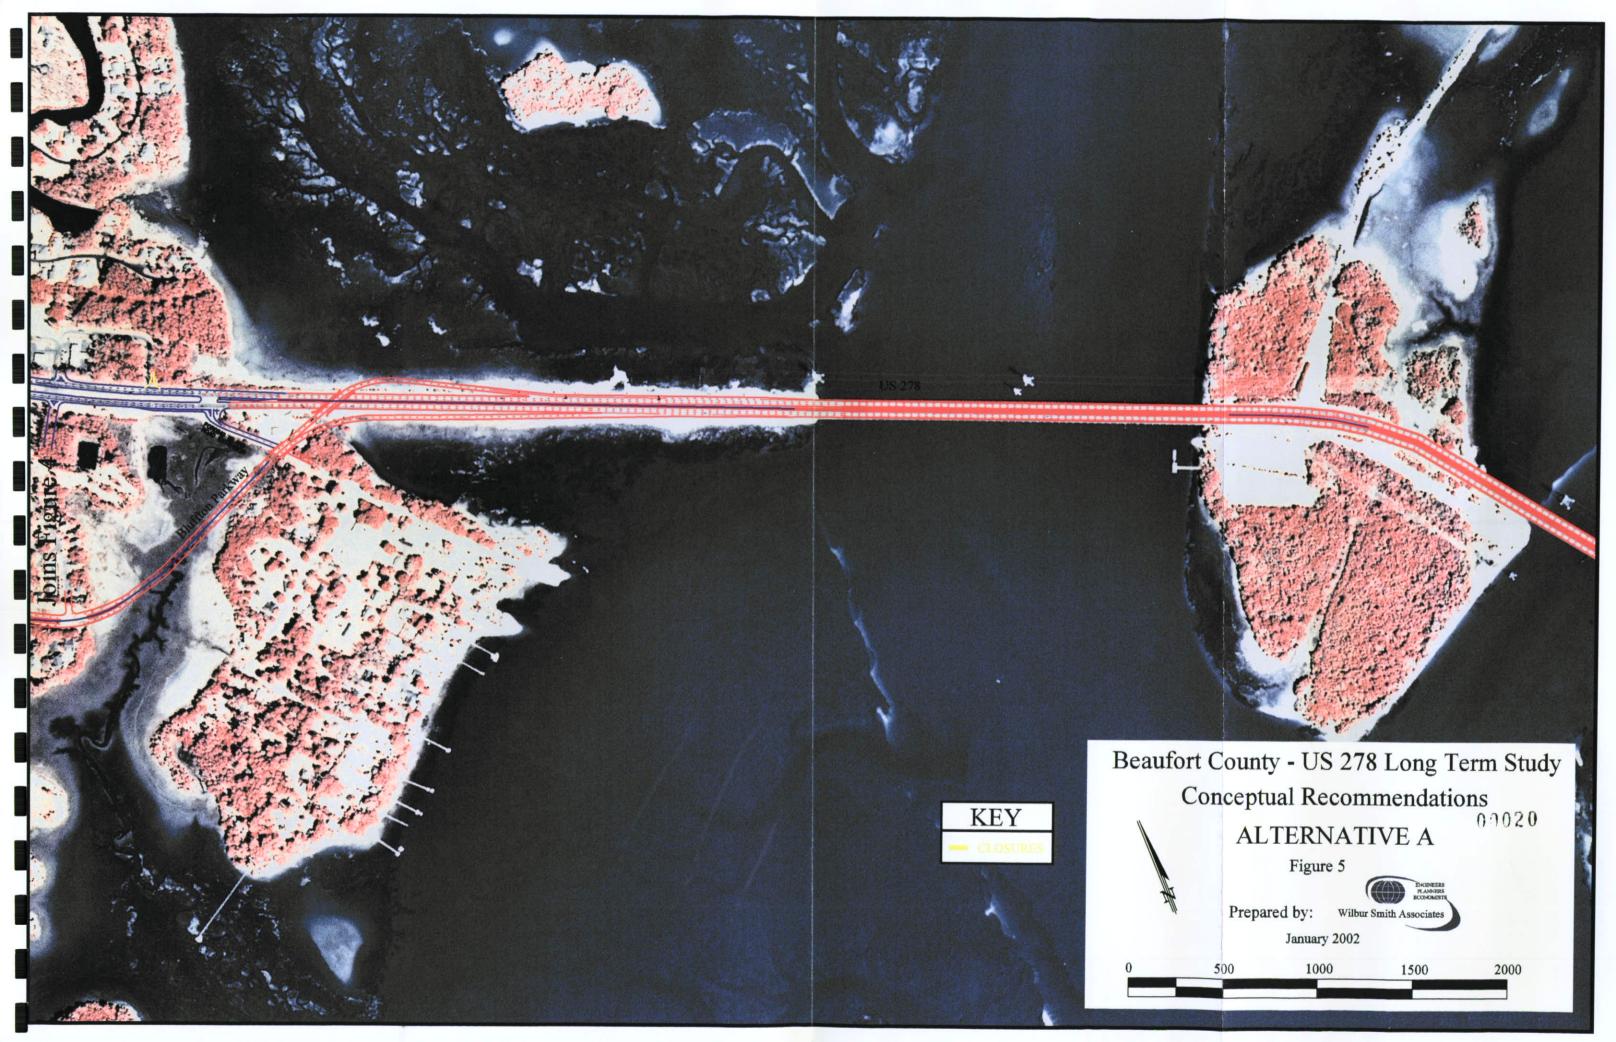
and 6 illustrate the proposed access ramps of US 278 at Bluffton Parkway and the widened 6-lane bridges to Hilton Head Island.
